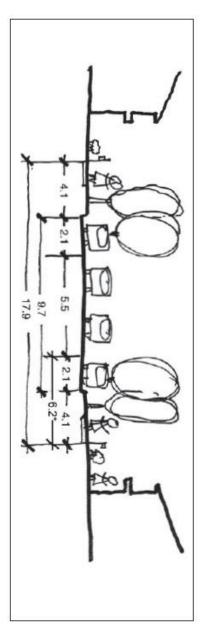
Access Street B Indicative Cross Section (Liveable Neighbourhoods 2009)
